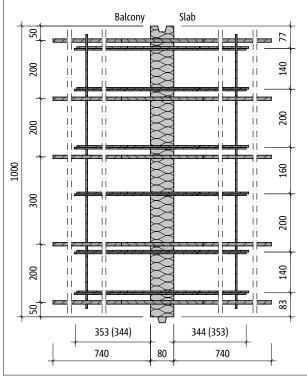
Schöck Isokorb® T type D-MM2-VV1: Layout
